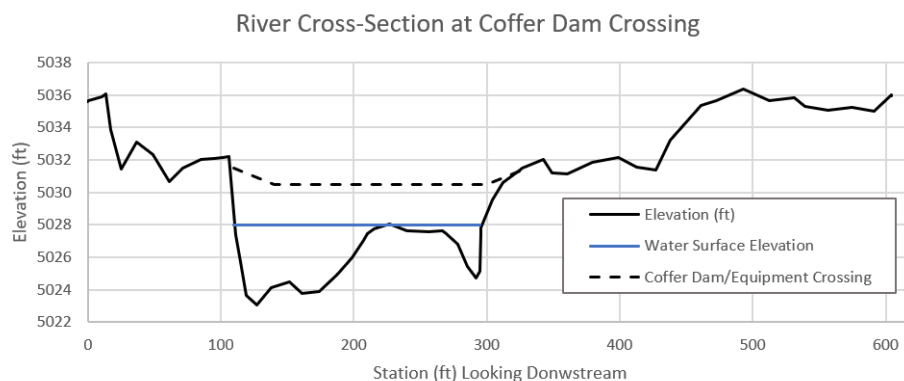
Cross-section schematic showing the elevation of the coffer dams to be constructed across the river channel.
